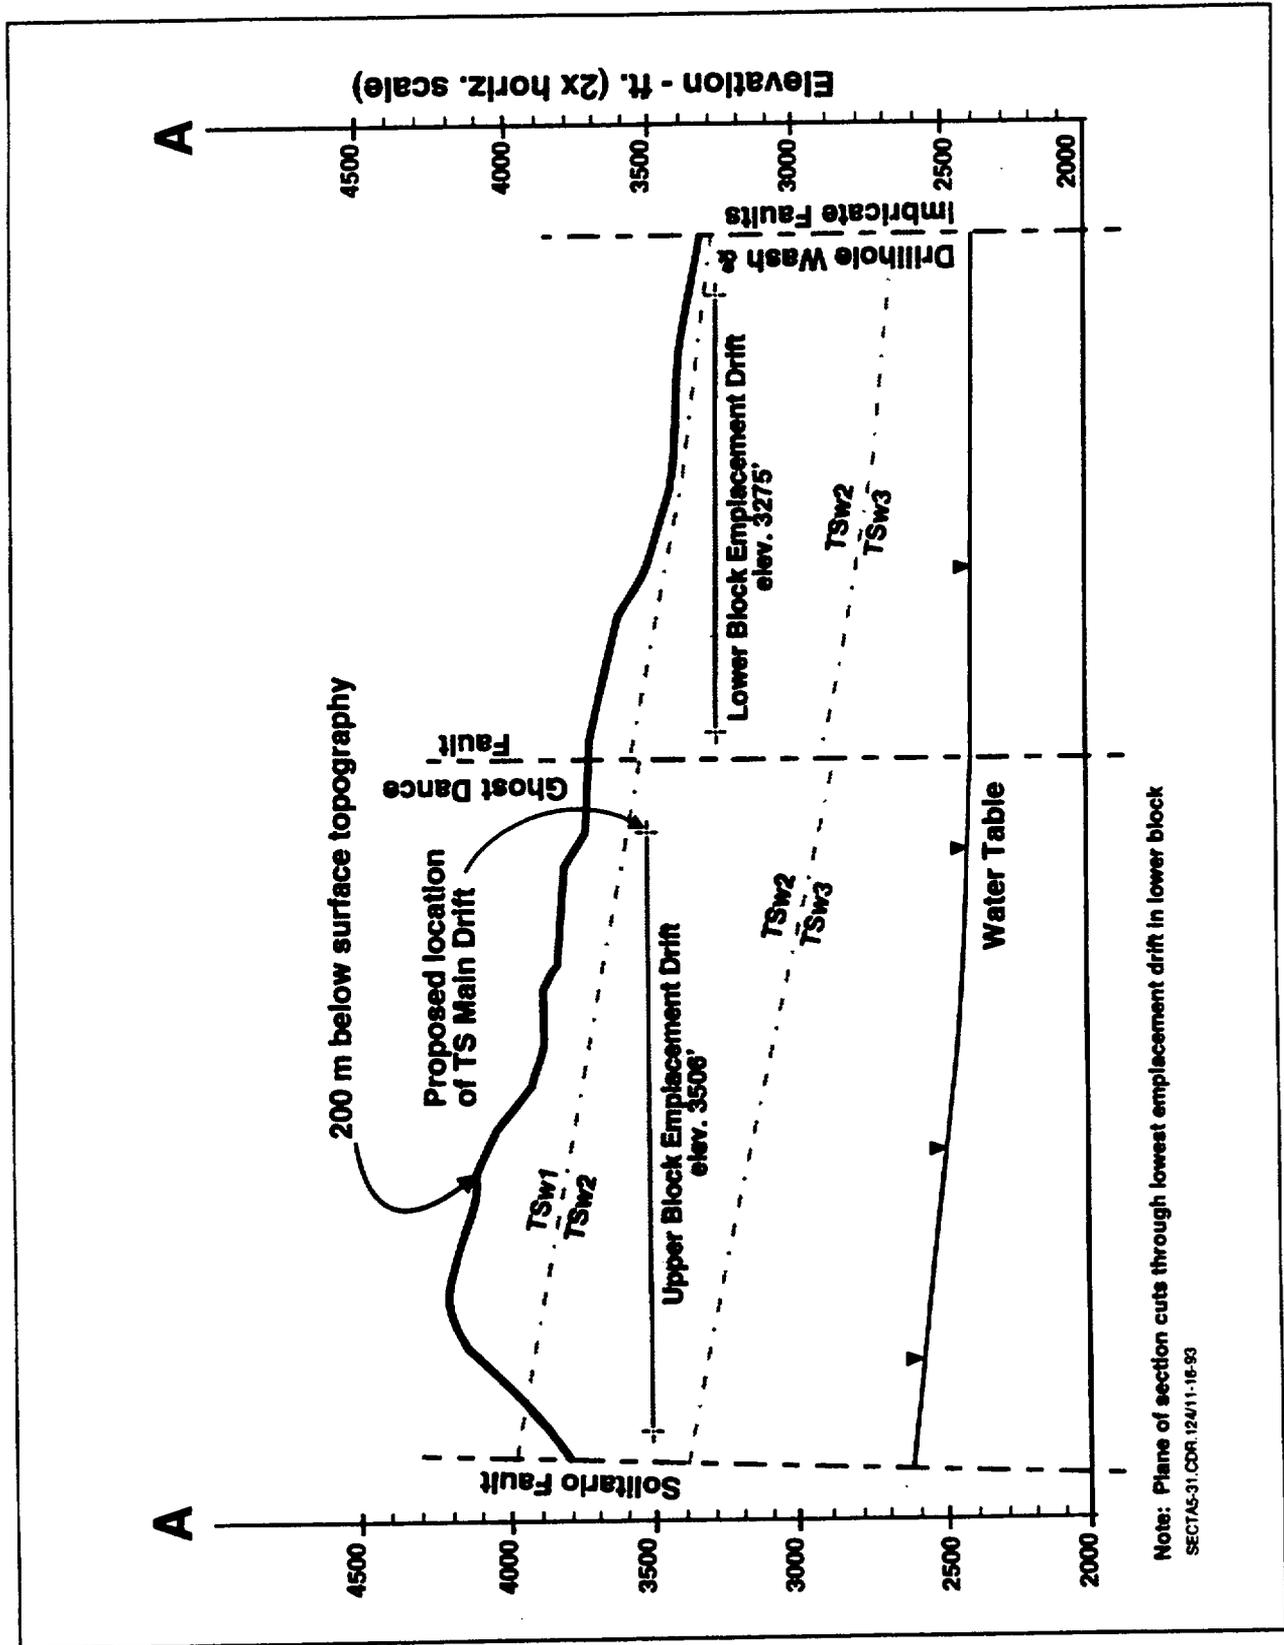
Cross-Section Through Expanded Conceptual Repository Layout
